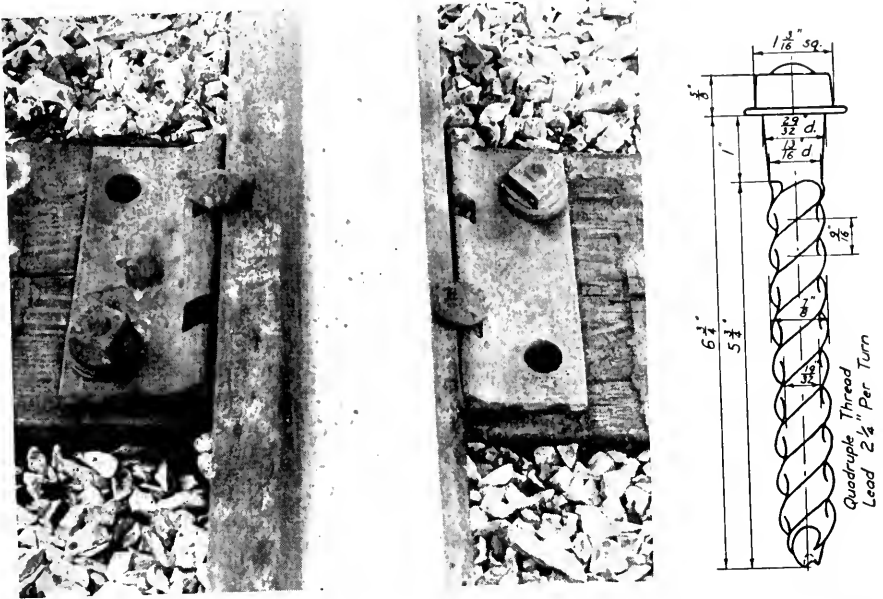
Section 12, $2\frac{7}{8}$ in. by $6\frac{3}{4}$ in. Oliver Hold-Down Drive Spikes with Double Coil Helical (Experimental) Spring Washers.
